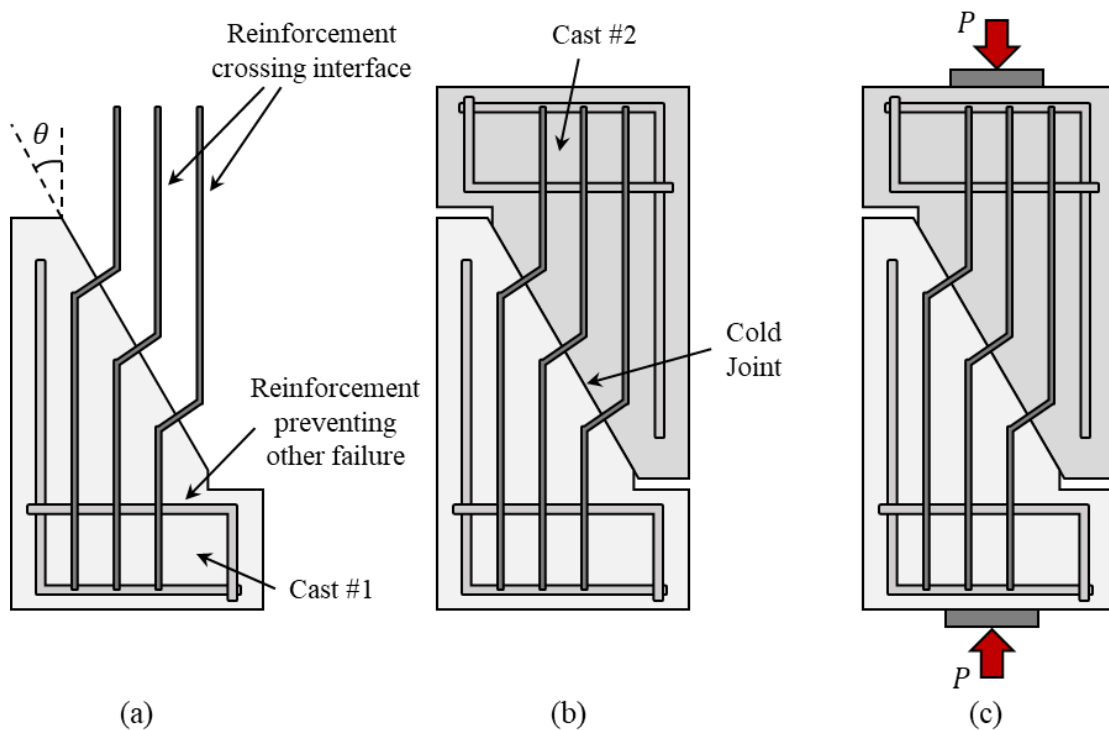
Typical casting and testing procedure for modified push-off tests: (a) casting of first component, (b) casting of second component, and (c) testing of modified push-off specimen
